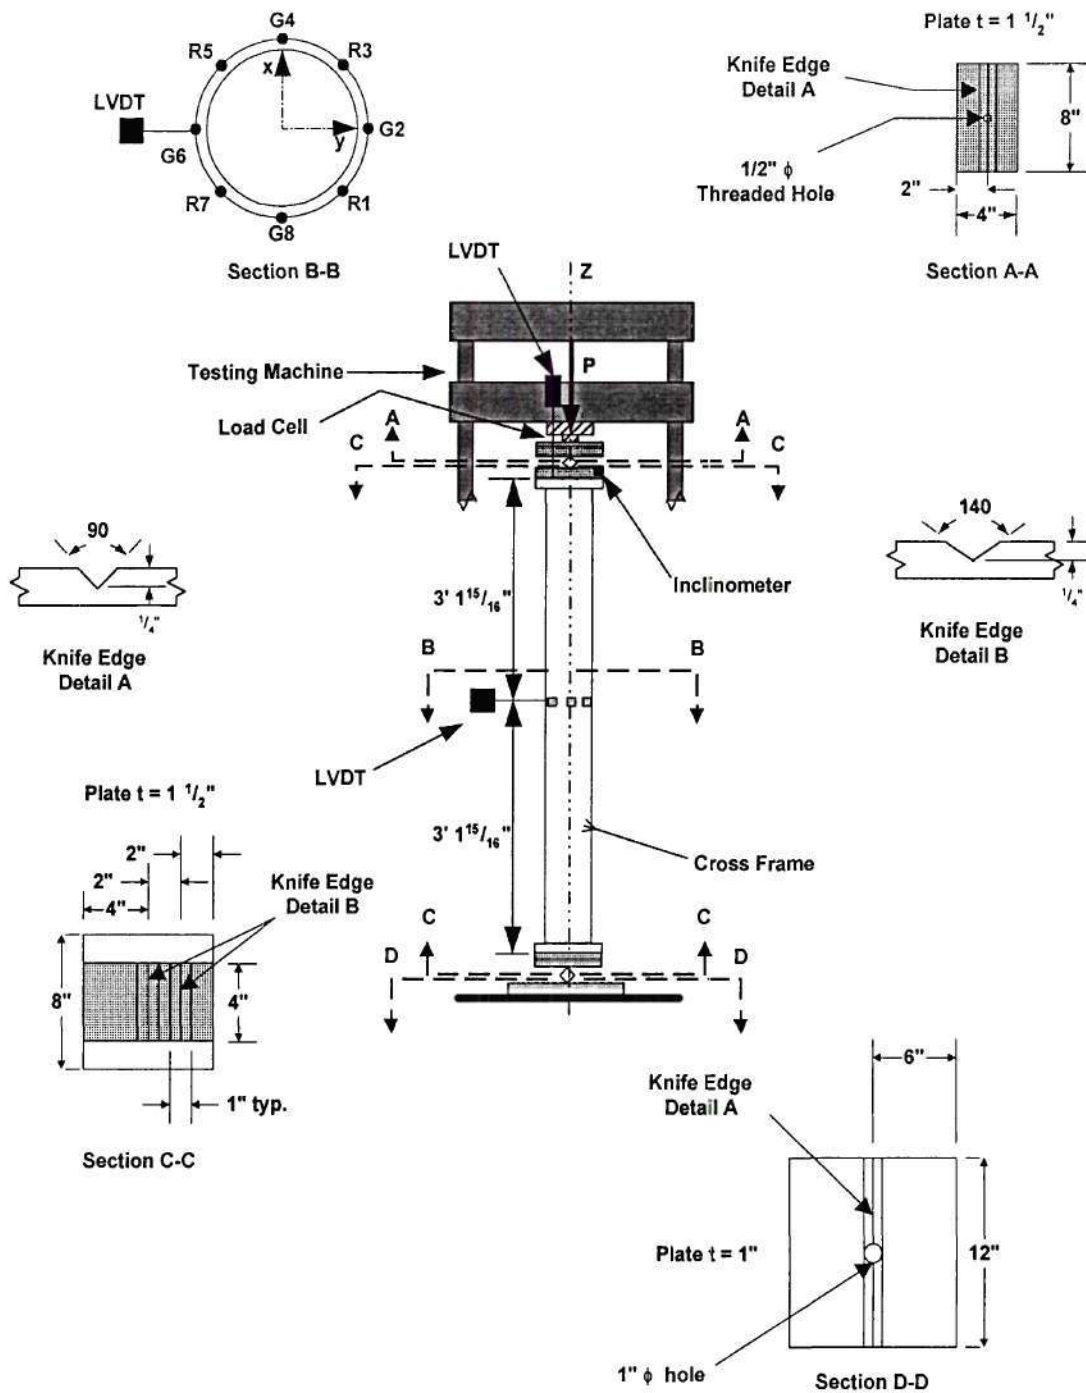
Elevation and Details for Tests 2C and 3C (not to scale)
